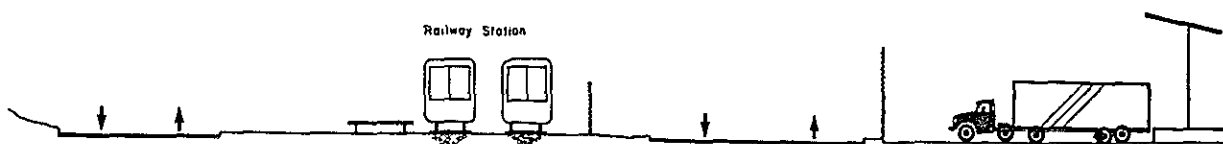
EXISTING CROSS SECTION OF VIA CERRO ANCON(1)
